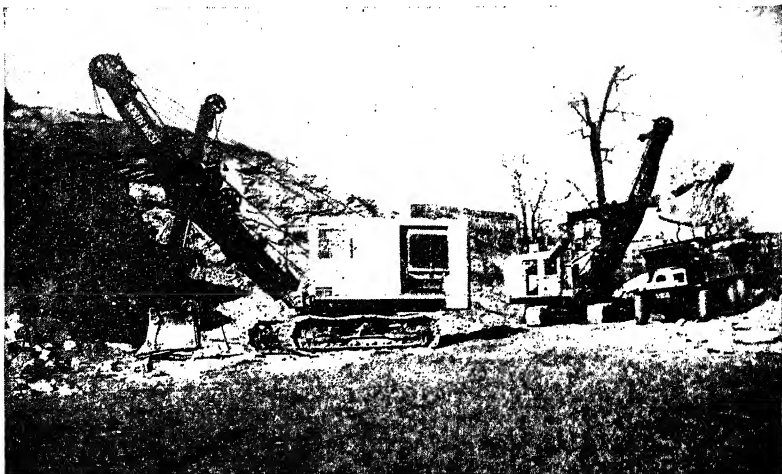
Northwest shovels in heavy rock cut for approach to George Washington Bridge, New York City. (*Courtesy of Northwest Engineering Company.*)
